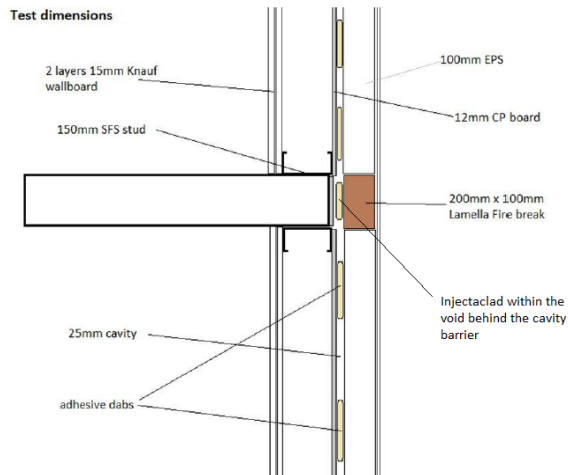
Cross-section of the cladding system (supplied by Test Sponsor).
